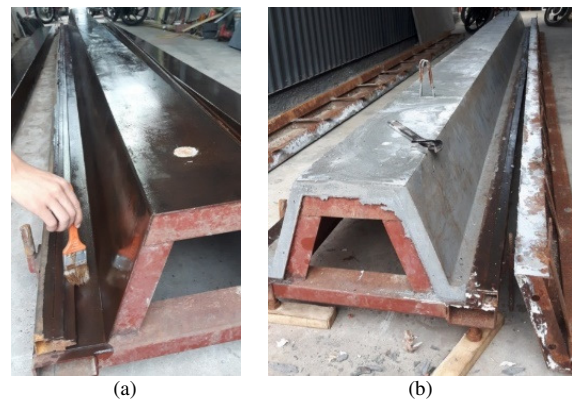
Fabrication of sheet pile: (a) formwork oiling, (b) UHPC sheet pile.
